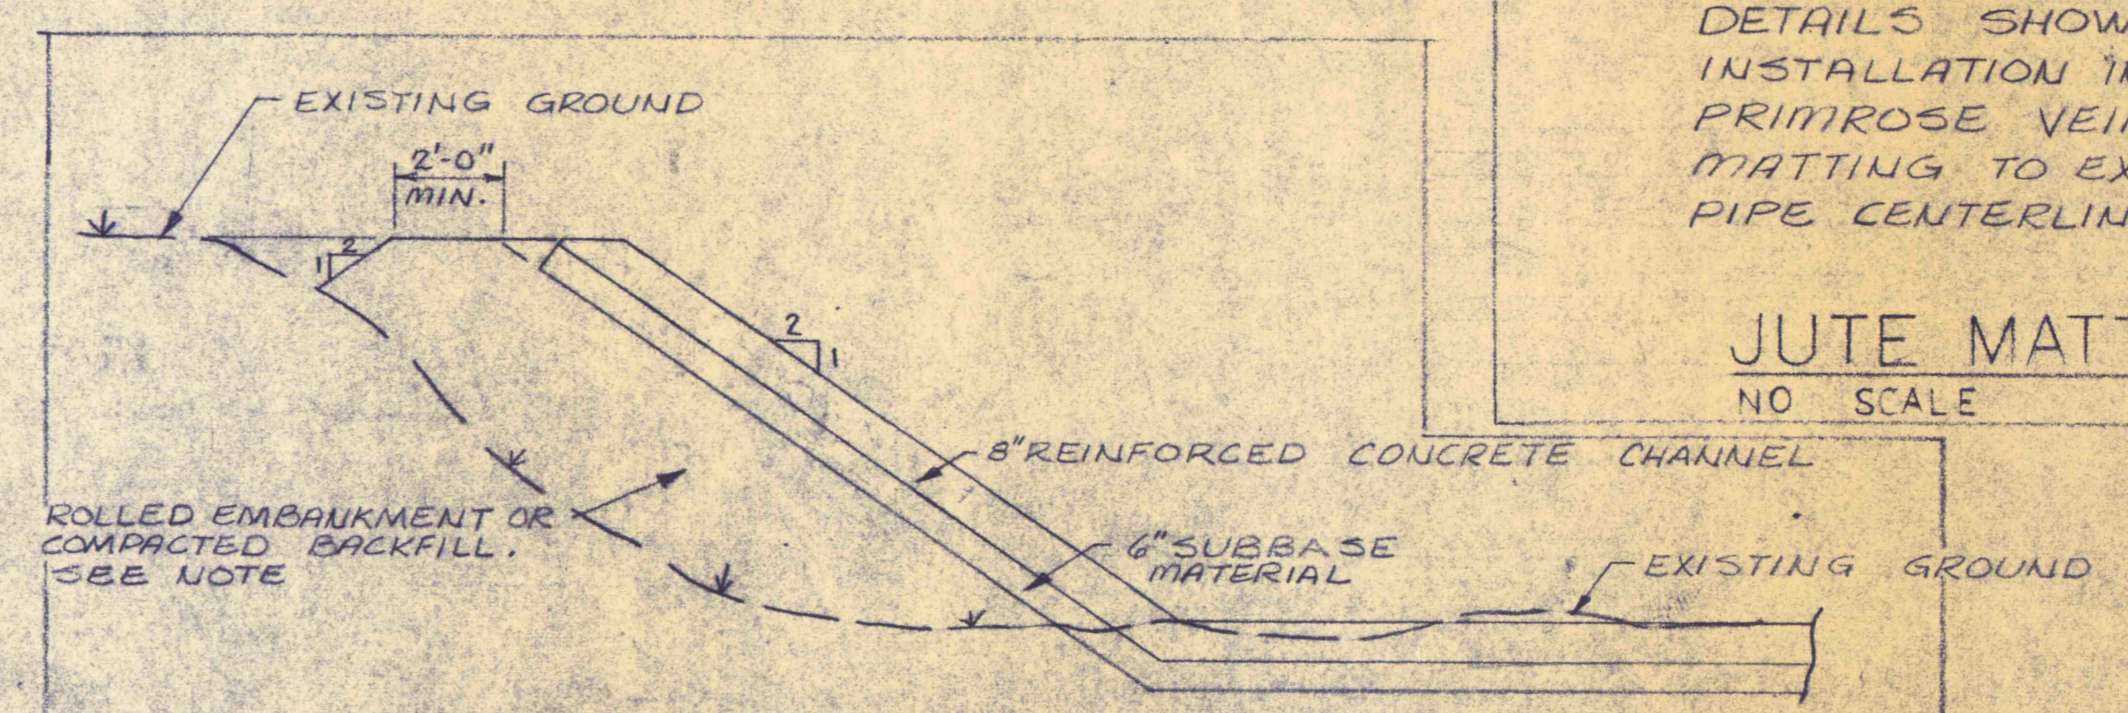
DETAILS SHOWING TYPICAL JUTE MATTING INSTALLATION IN DRAINAGE SWALE AT PRIMROSE VEIN CHANNEL ENTRANCE. MATTING TO EXTEND 80' LT. AND 200' RT. OF PIPE CENTERLINE. SEE SHEET 3 OF 9.
